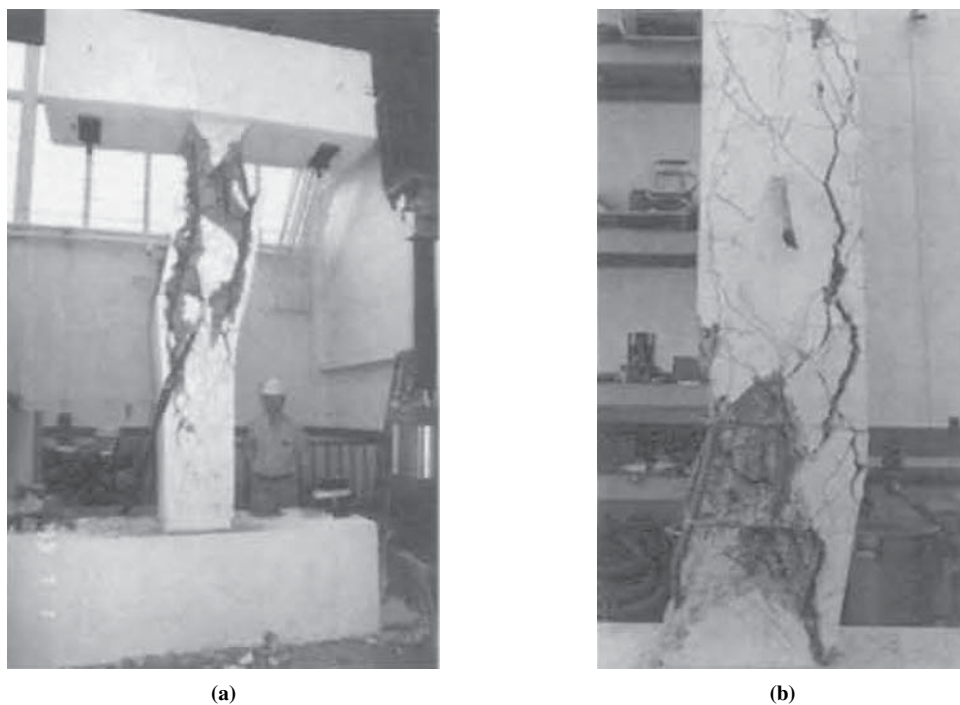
Damage after failure: a) specimen 1, b) specimen 3 (Sezen and Moehle, 2006).
